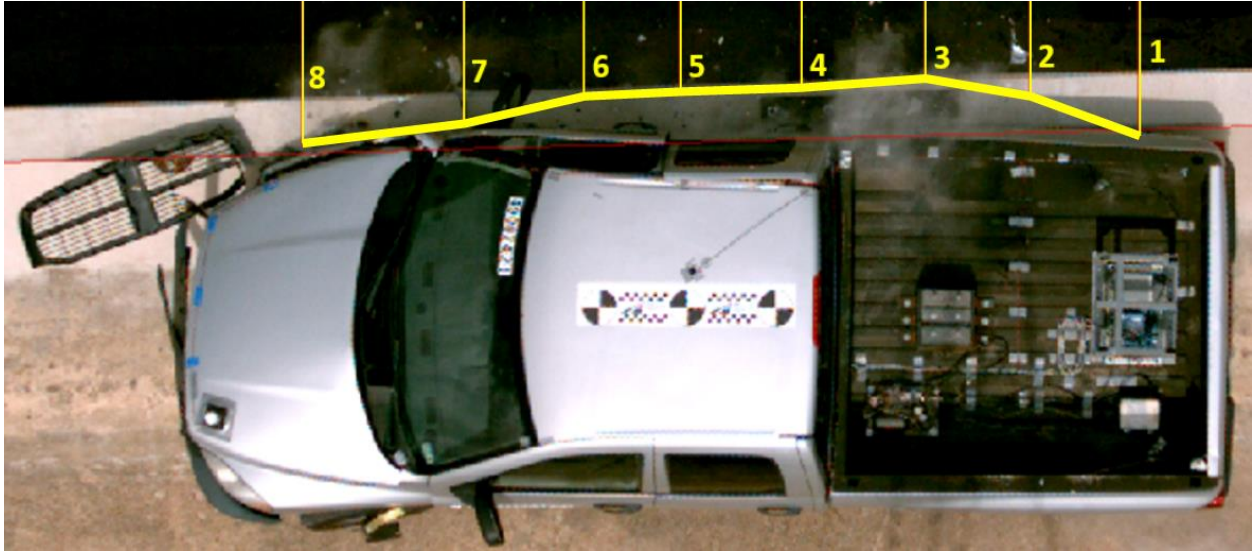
Sketch of Vehicle Extension (Front Passenger Corner) over Barrier (TTI Test Number 490024-2-1)
